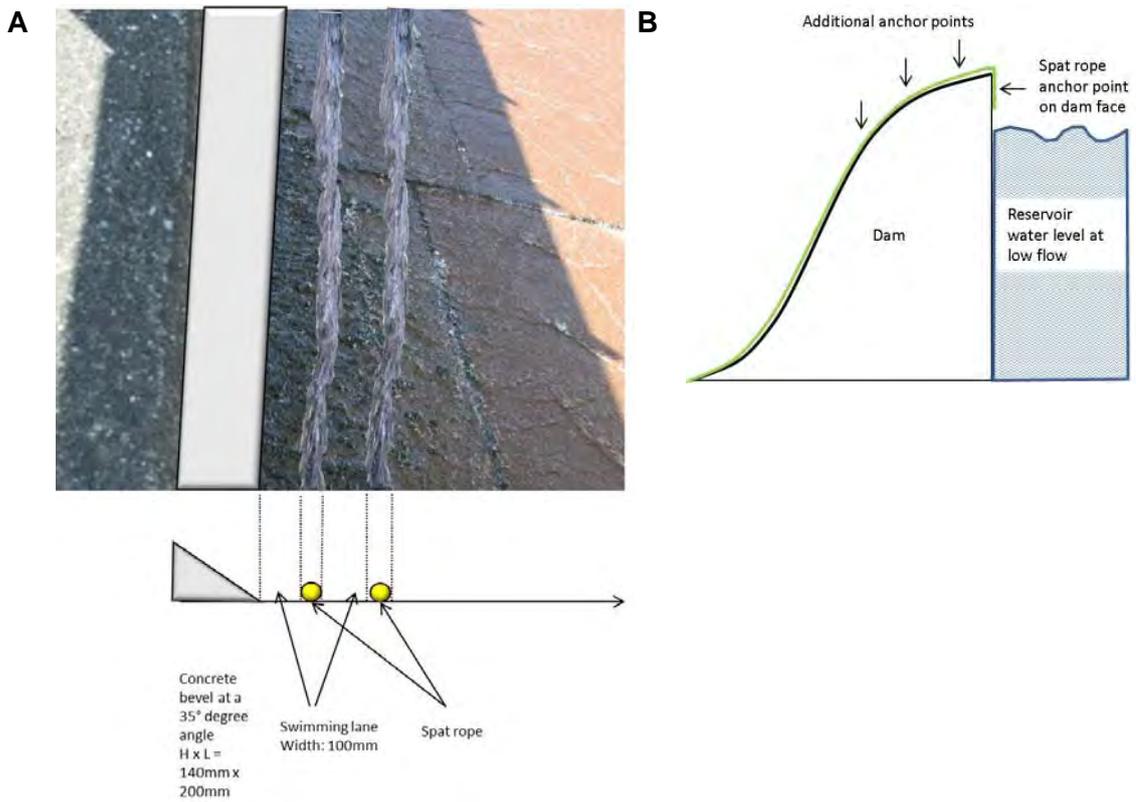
A) Schematic details of the concrete bevel and the two spat ropes and B) potential anchor points for the spat ropes on the spillway and dam face. Note: Drawings are not to scale.
